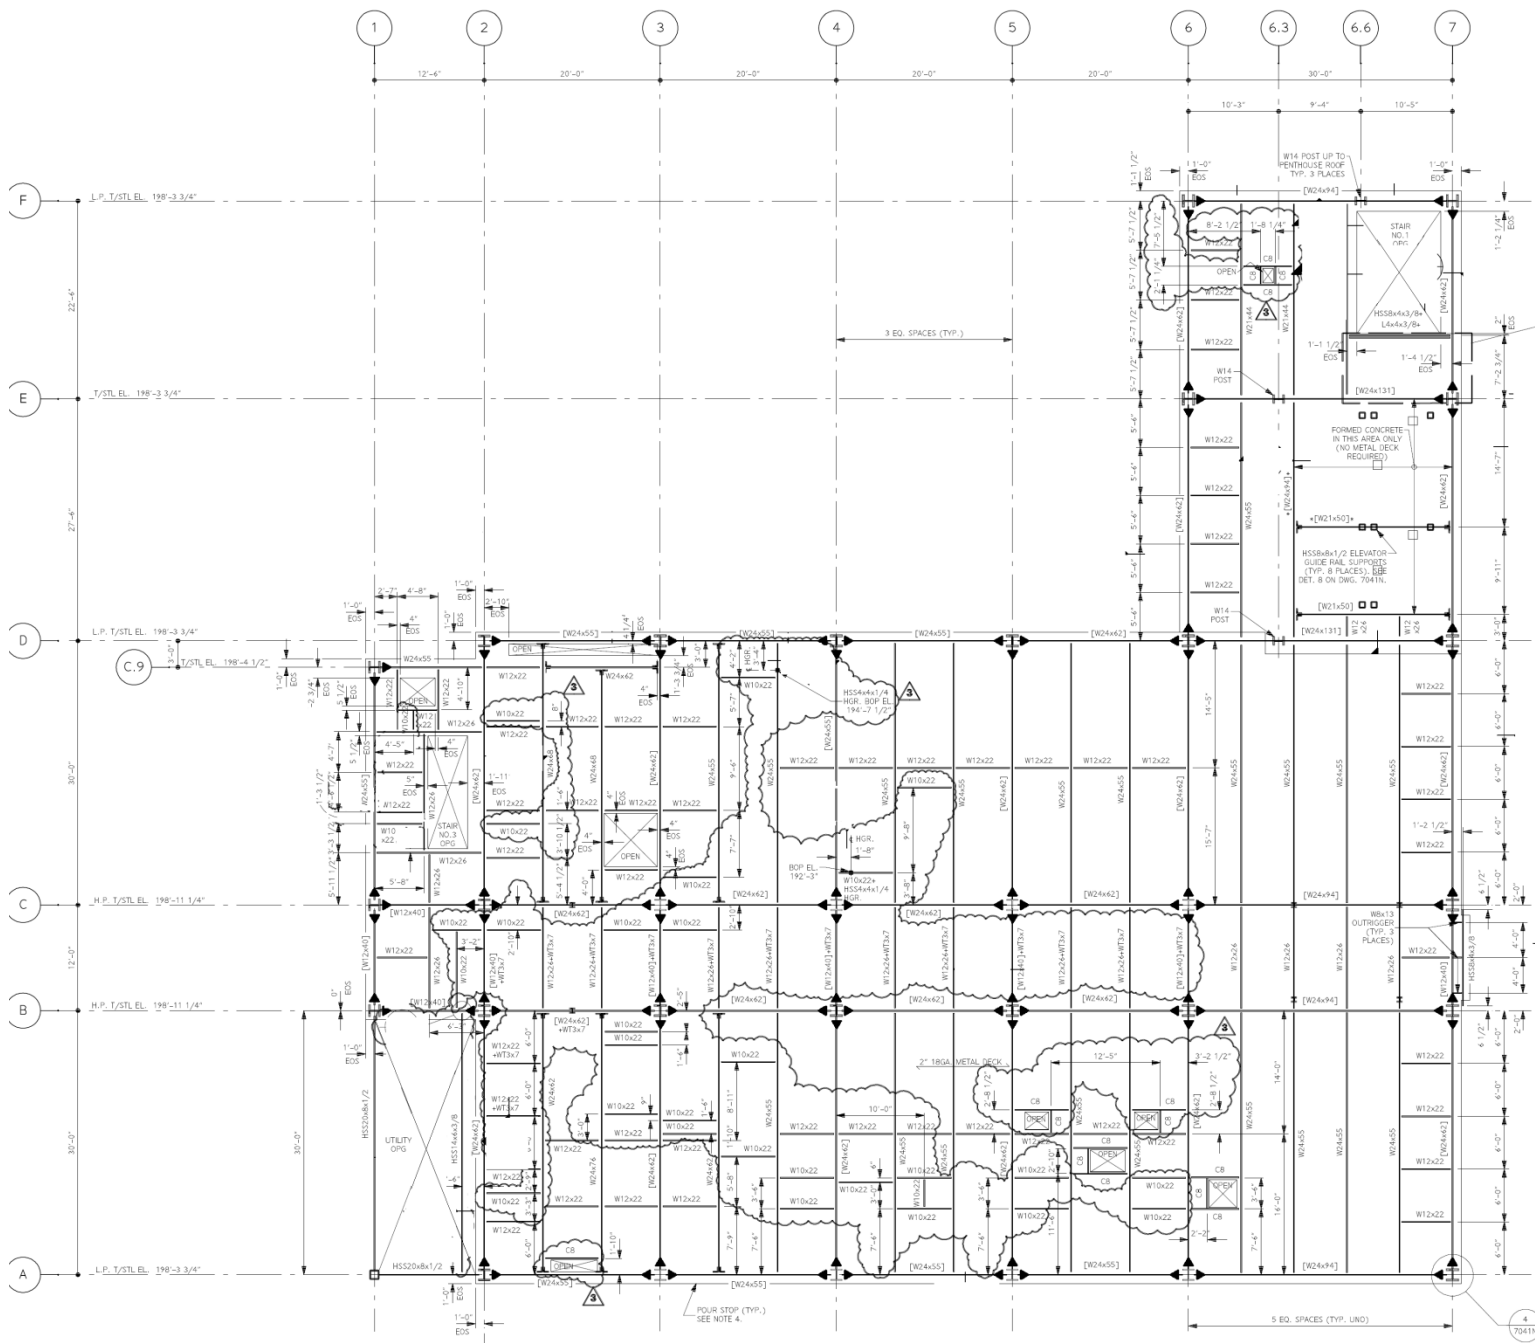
Courtesy of Project Engineer. The roof framing plan.
